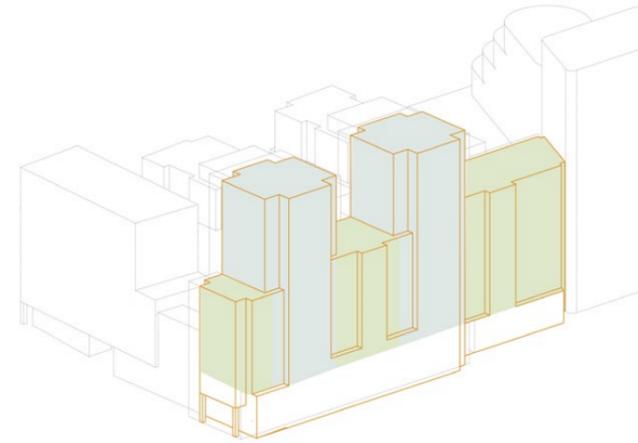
Building B2B3 massing articulation to achieve dual aspect
